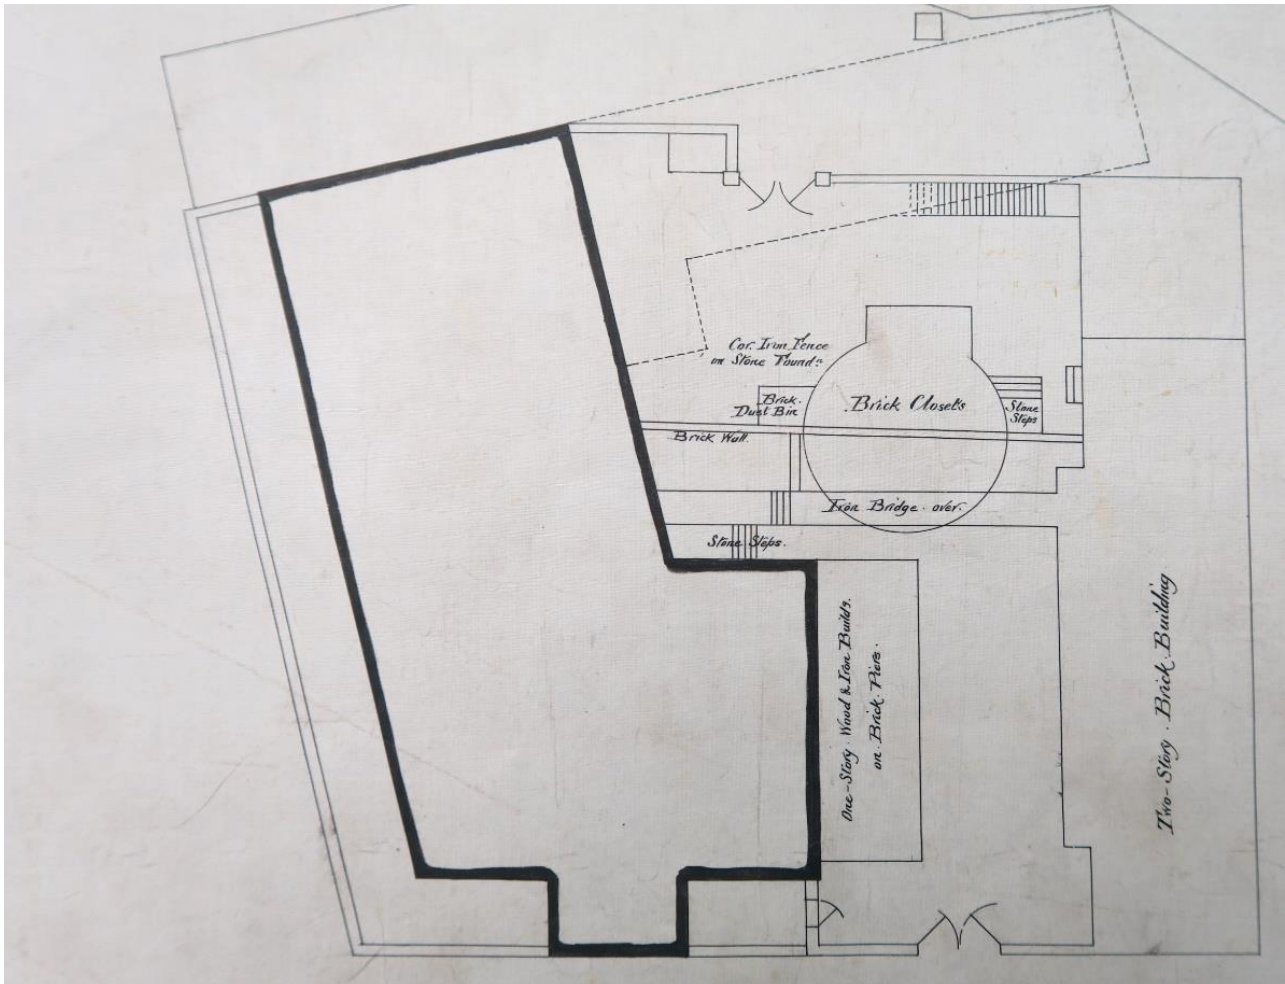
Site Plan showing buildings, dated 1897 (original Treasury Building shown heavily outlined)
